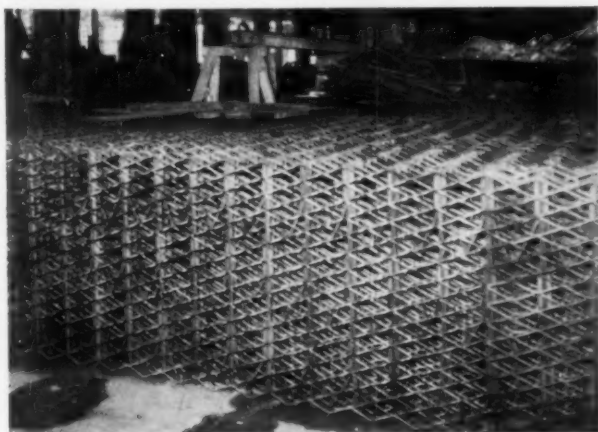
Vault Floor Reinforcing on Edge, Spaced by Vertical Bars
